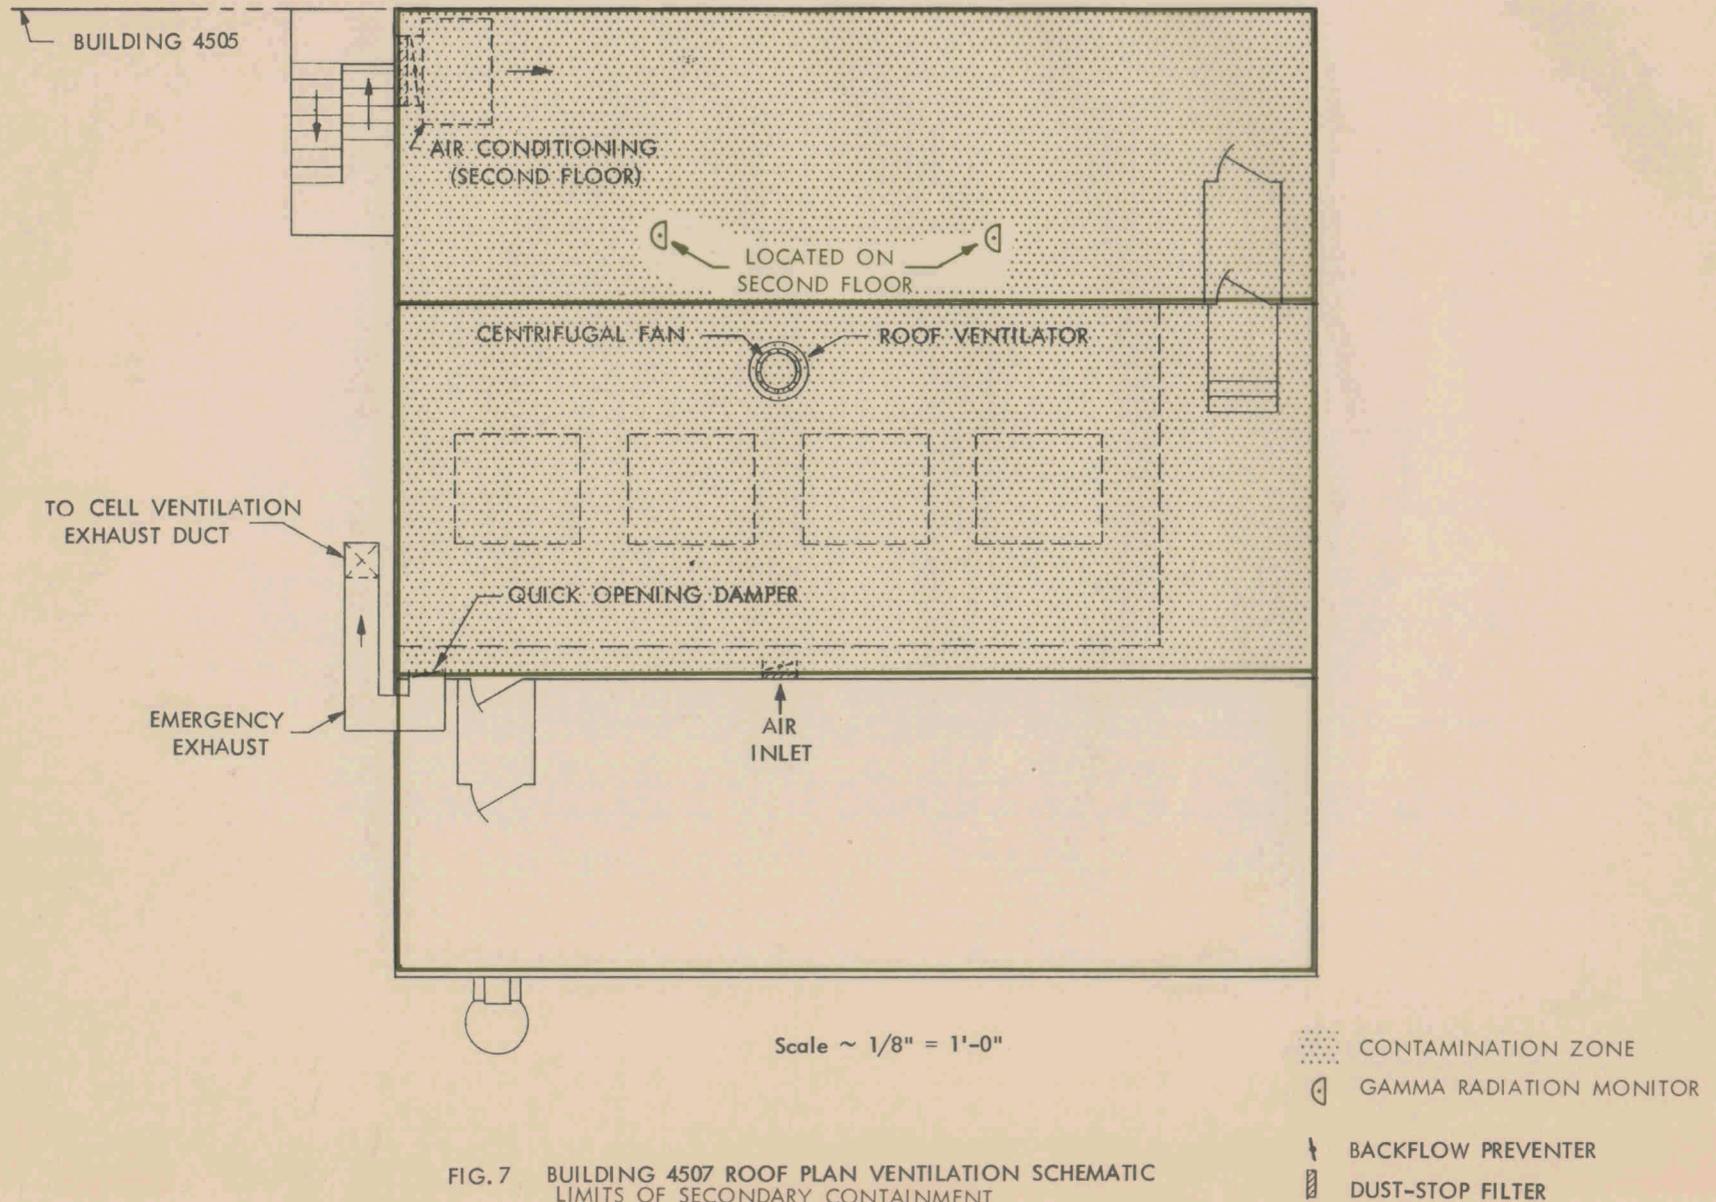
BUILDING 4507 ROOF PLAN VENTILATION SCHEMATIC
